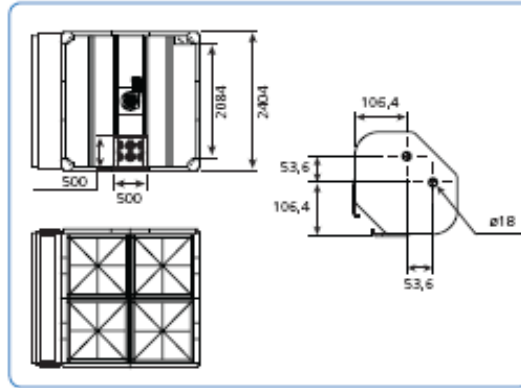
Accessories overall dimensions - ladder tower mounting in lateral mounting of SuperJet filters [10].
